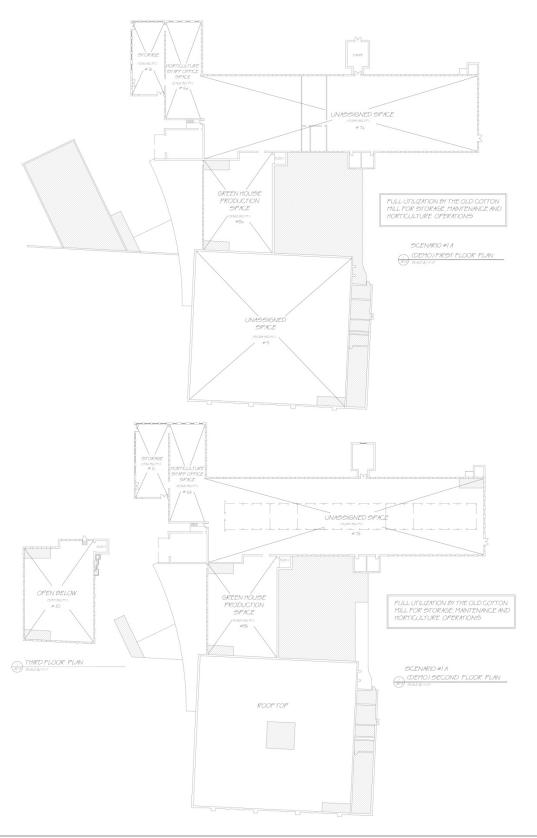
Horticulture operation - Option 1A Ground and Second Floor Plan
